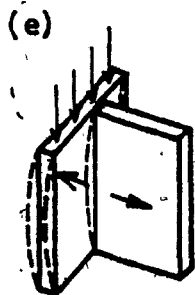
POTENTIAL FORCES AT HORIZONTAL JOINT DUE TO GRAVITY LOADS, (REF. 5)
